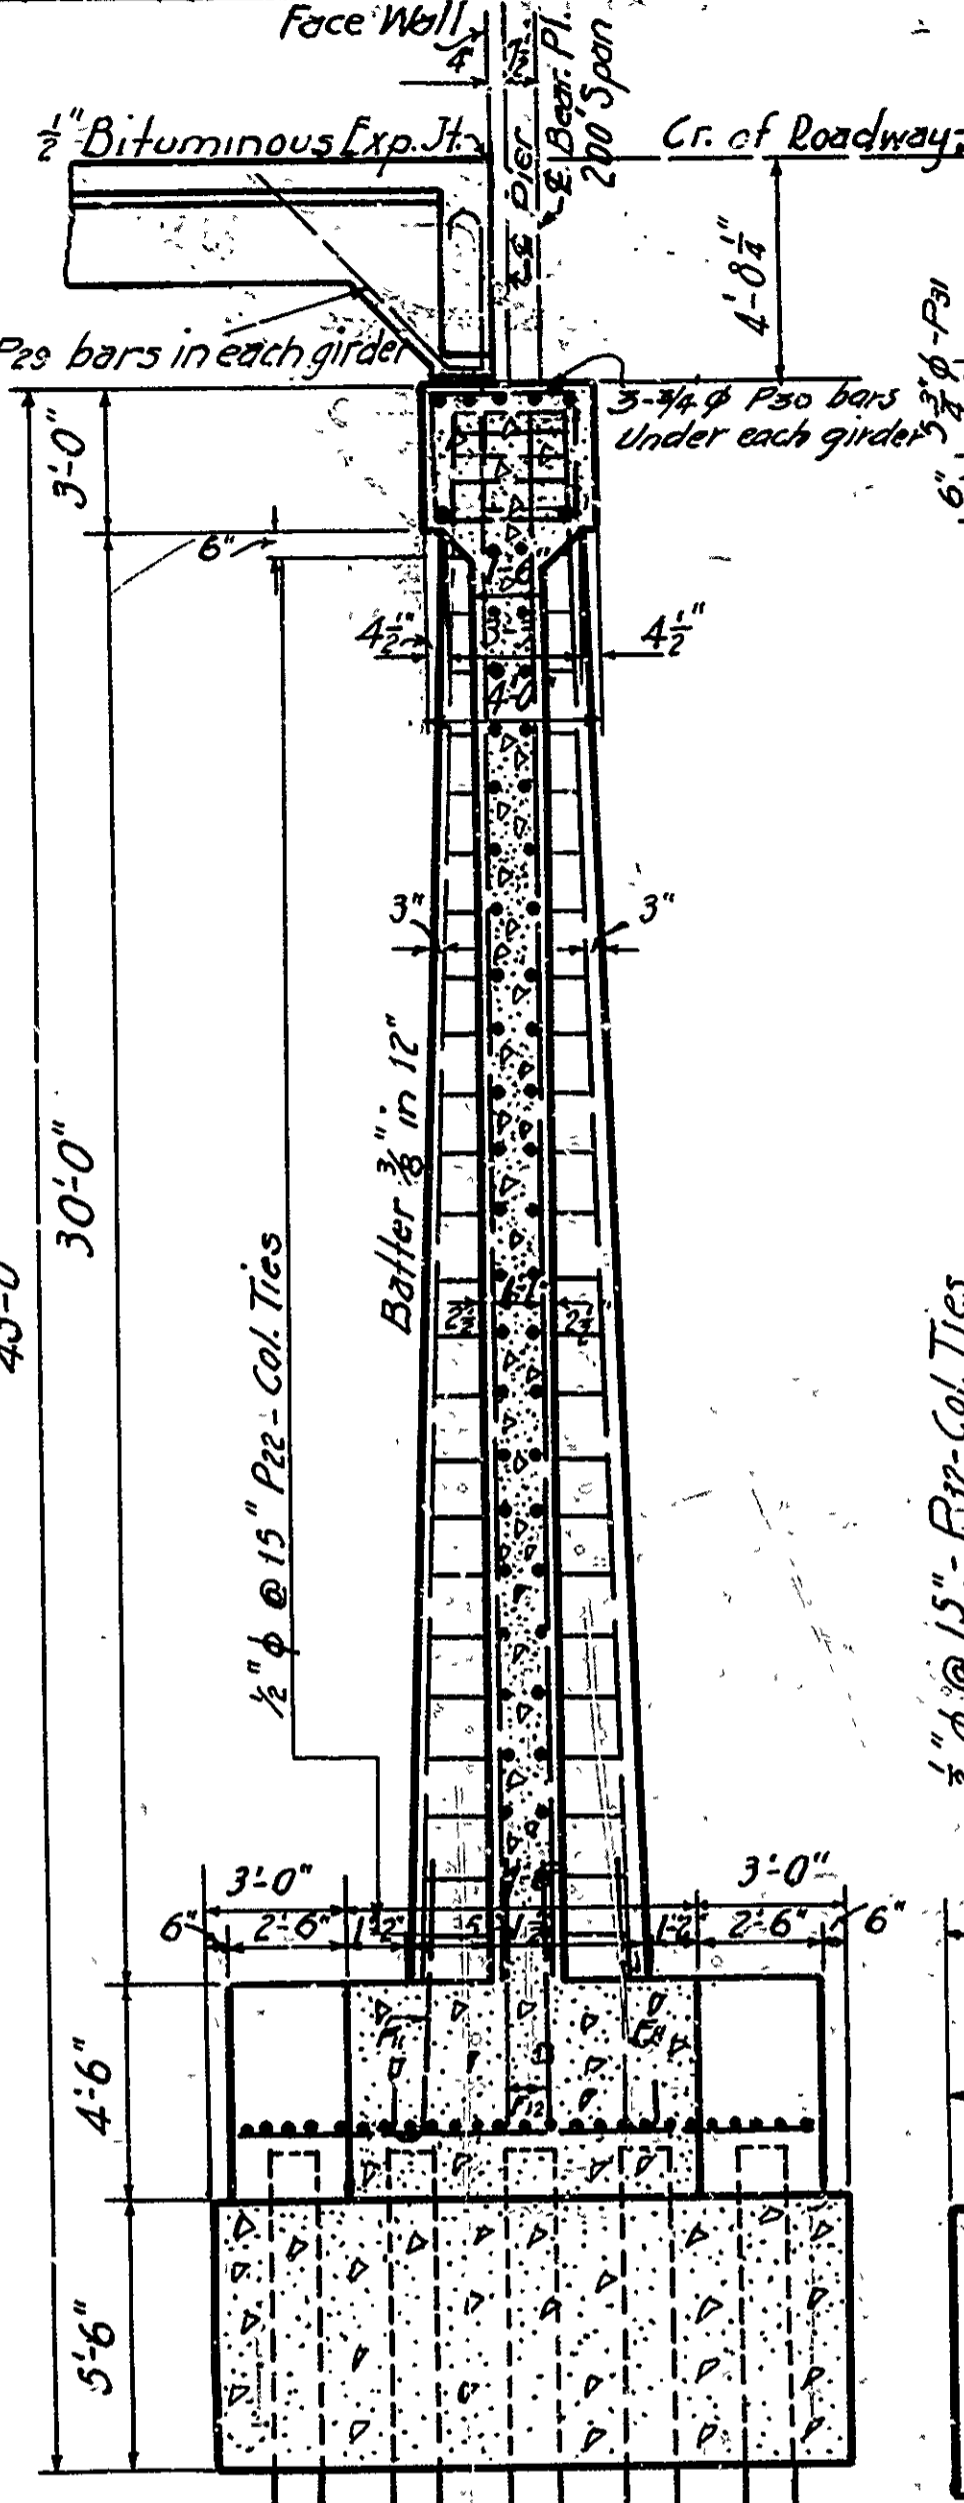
DETAILS OF STANDARD 30'-0" R.C.D. GIRDER 3 GIRDER TYPE 20'-0" CLEAR RDWY.
